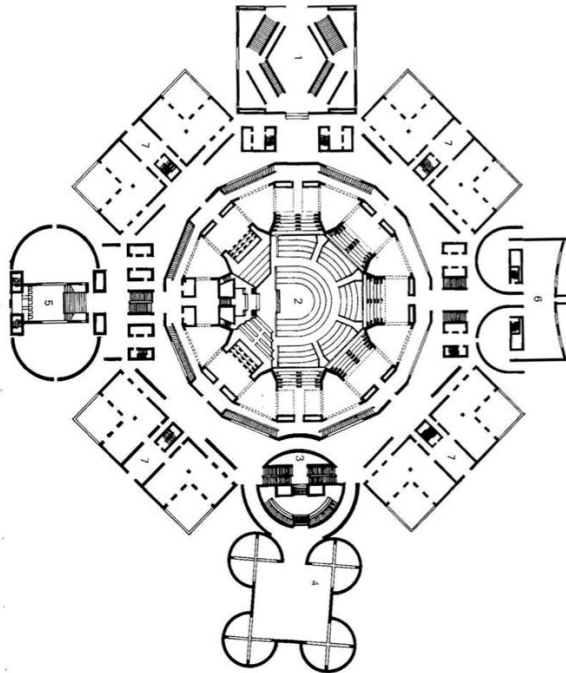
Louis Kahn, floor plan, Bangladesh Parliament Building, Dhaka, Bangladesh, 1962.
